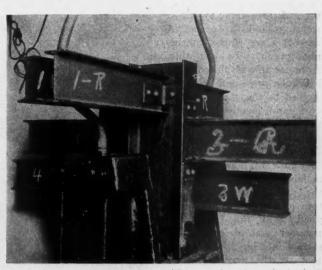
Vibration Test Piece Showing Riveted Connections.
